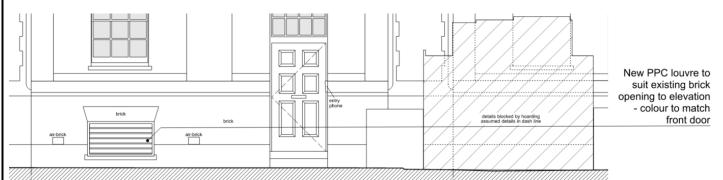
(as above): Front elevation of Bedford Avenue showing the ventilation grill as approved in 2019/3676/P.
